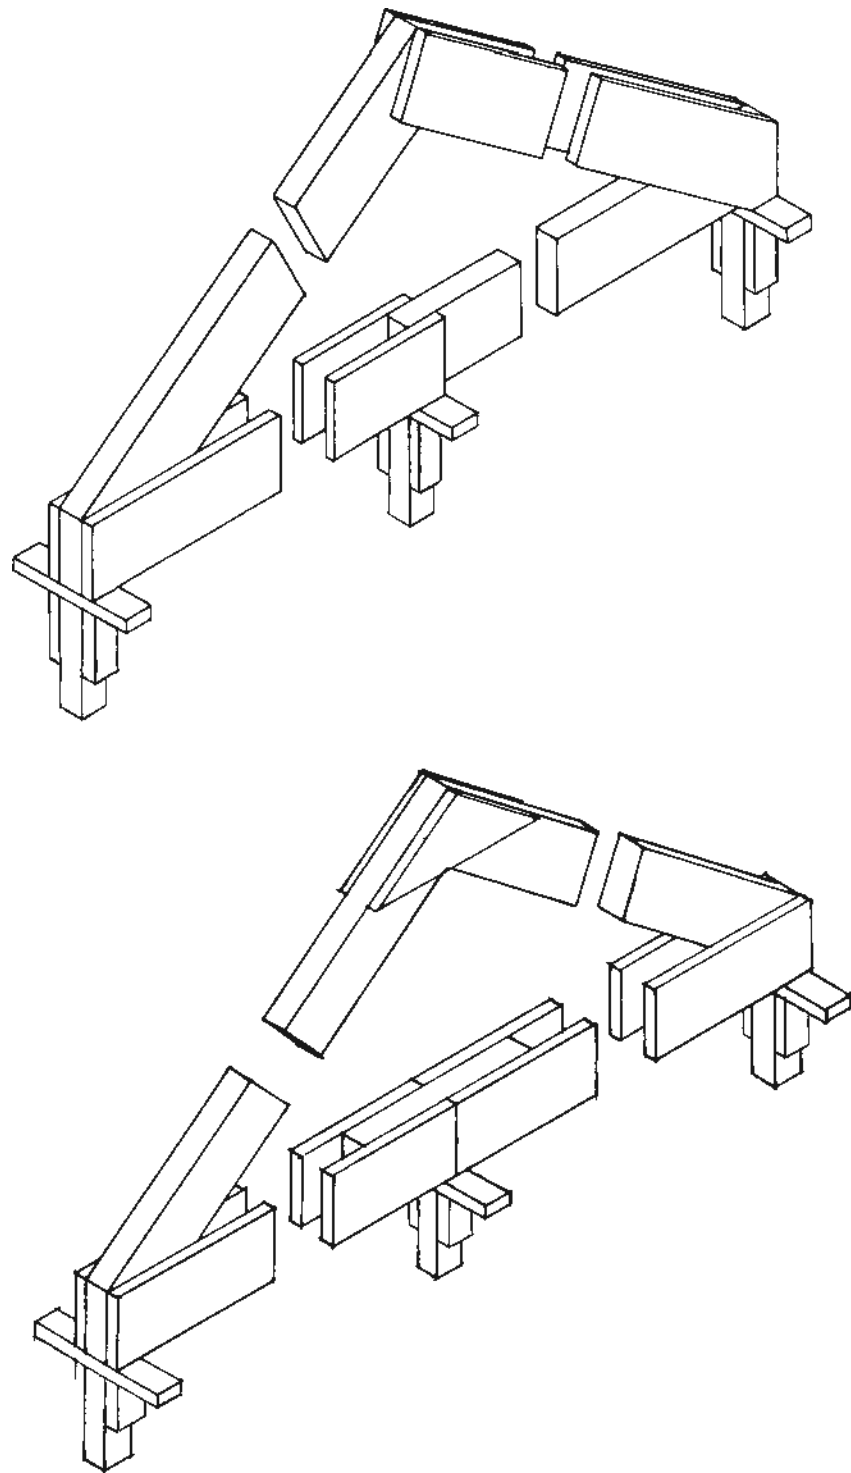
Spaced Beam Bearing at Second Floor Over Interior Post
